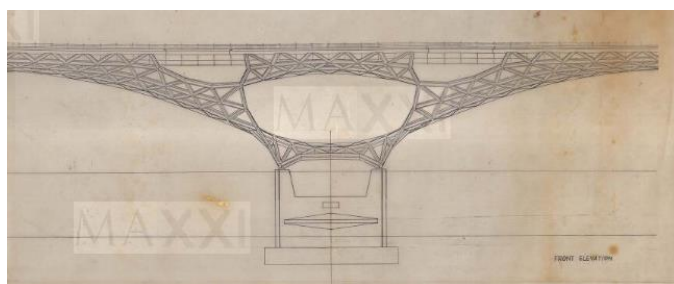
Niger bridge (1977) - Span Front Elevation - Centro Archivi MAXXI, Museo Nazionale delle arti del XXI secolo.
